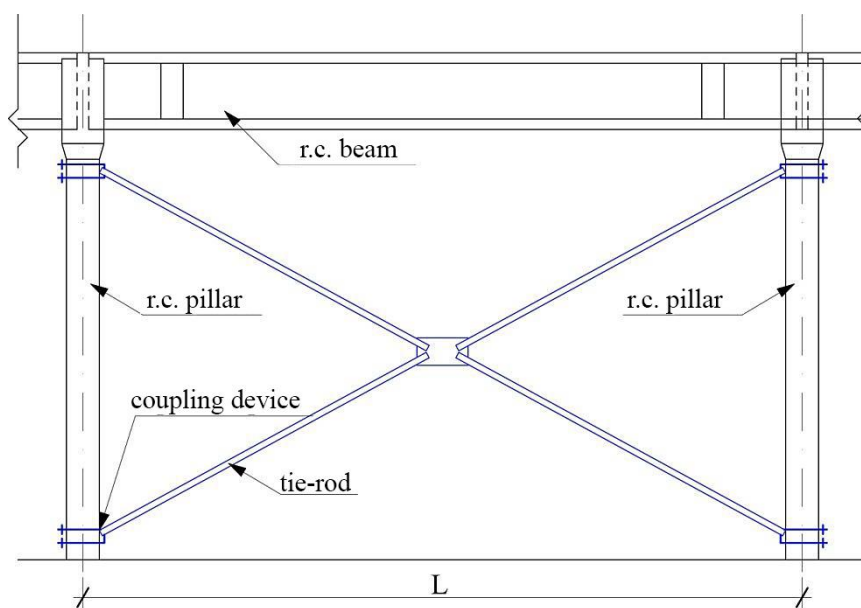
The longitudinal rigidization of a bridge crane trestle with passive tie-rods system
